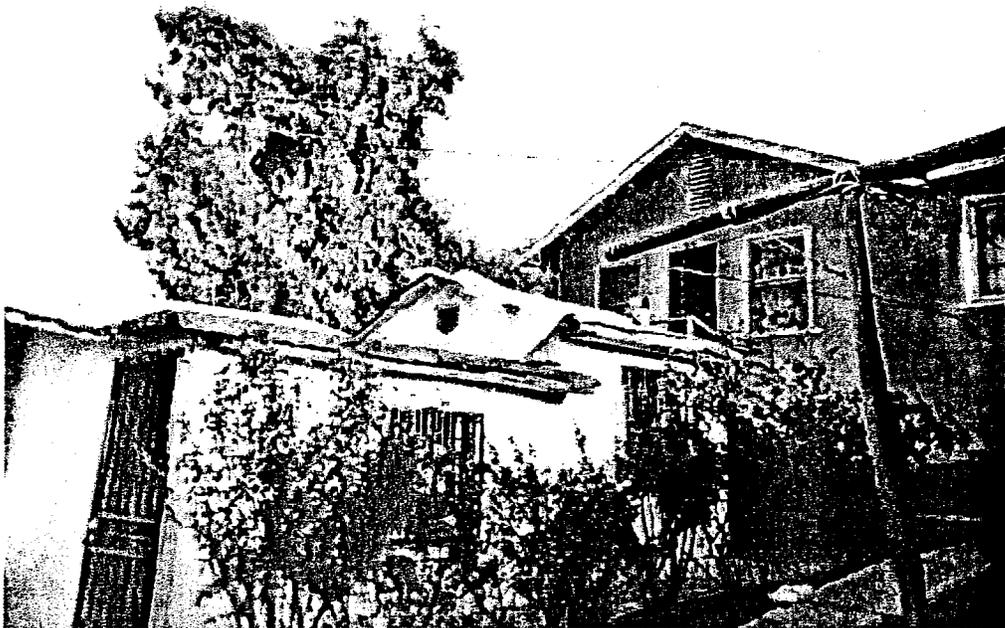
A residential structure located on Fowler St. Note the damaged roofline and the use of plastic sheets to prevent leakage.
